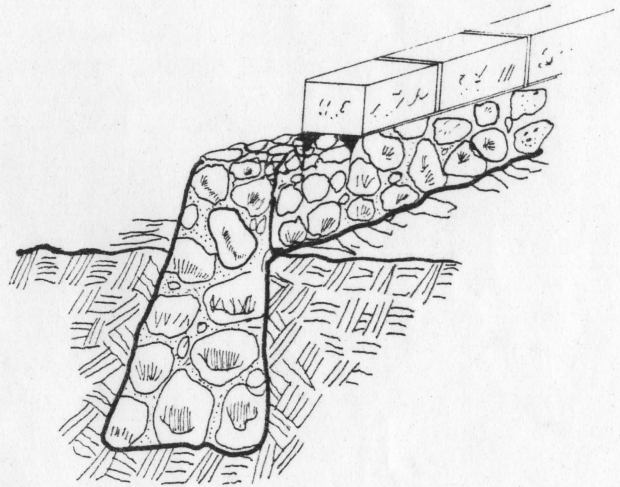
A typical masonry footing with foundation wall (after ref 10)
